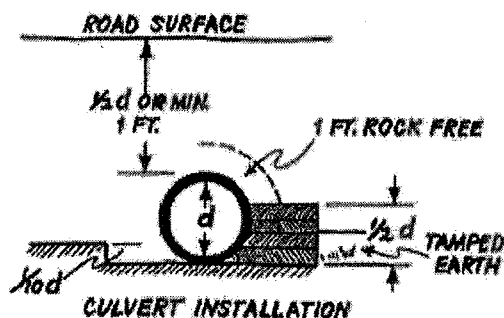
The elements of a properly installed ditch relief culvert. The culvert is angled at about 30 degrees to the road alignment to help capture flow and prevent culvert plugging or erosion of the inlet area. It is set at the base of the fill (ideally) or with a grade slightly steeper than the grade of the contributing ditch (but never with a grade less than 2 percent) (USDA-SCS, 1983). At a minimum, the grade of the ditch relief culvert should be sufficient to prevent sediment accumulation at the inlet or deposition within the culvert itself (it should be self-cleaning) (USDA-SCS, 1983).
